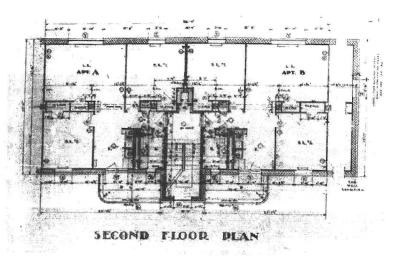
"Architectural Masterpiece." *Unit Plans*, Details Section.
